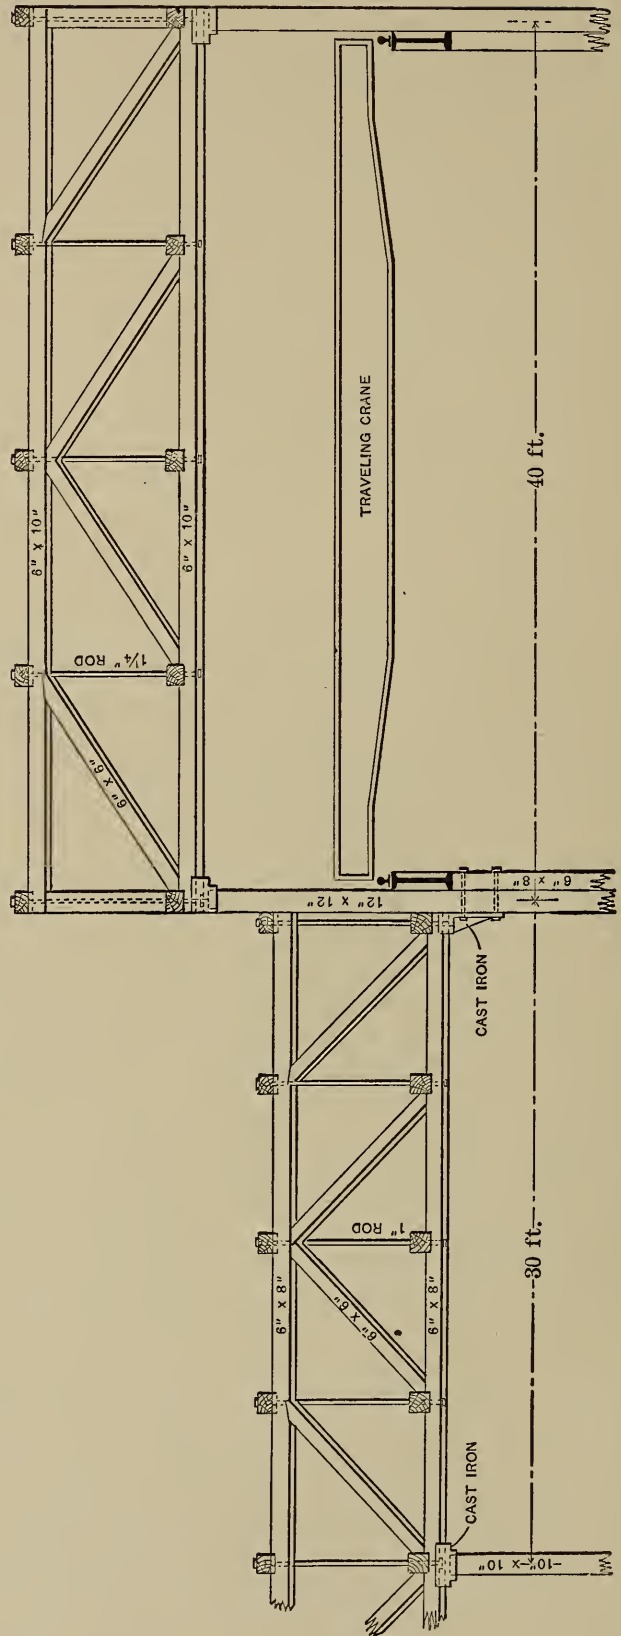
Transverse Section of Saw-tooth Roof of Wood Construction.
